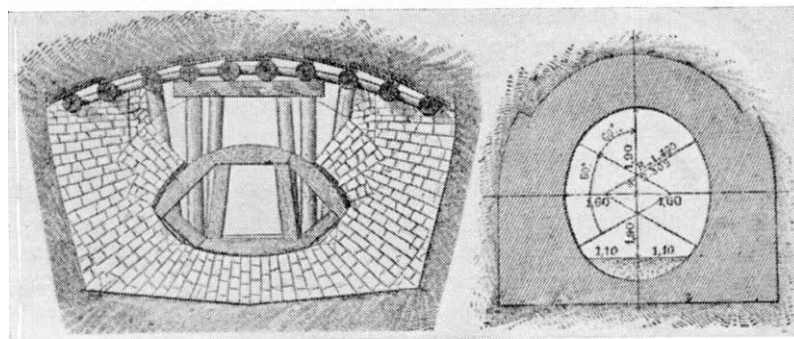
By filling in the excavated space with stone, leaving only a small pilot tunnel open in the centre, the Italian tunnellers finally succeeded in stabilizing the ground (left). The finished Cristina Tunnel is merely a small opening enclosed by a tremendous stone structure. But even this structure did not prove wholly stable and it became necessary to trim the sides to enable a train to squeeze through the tunnel.
